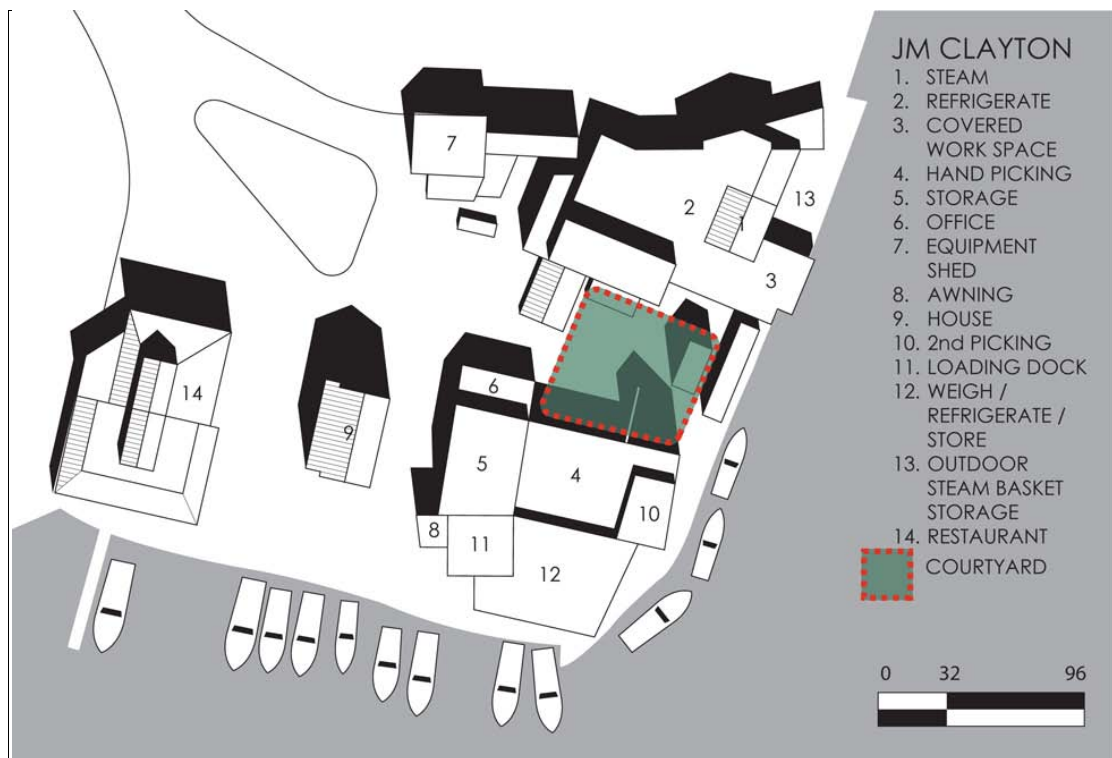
JM Clayton Co Site plan with Working Courtyard Highlighted. Author Illustration.
